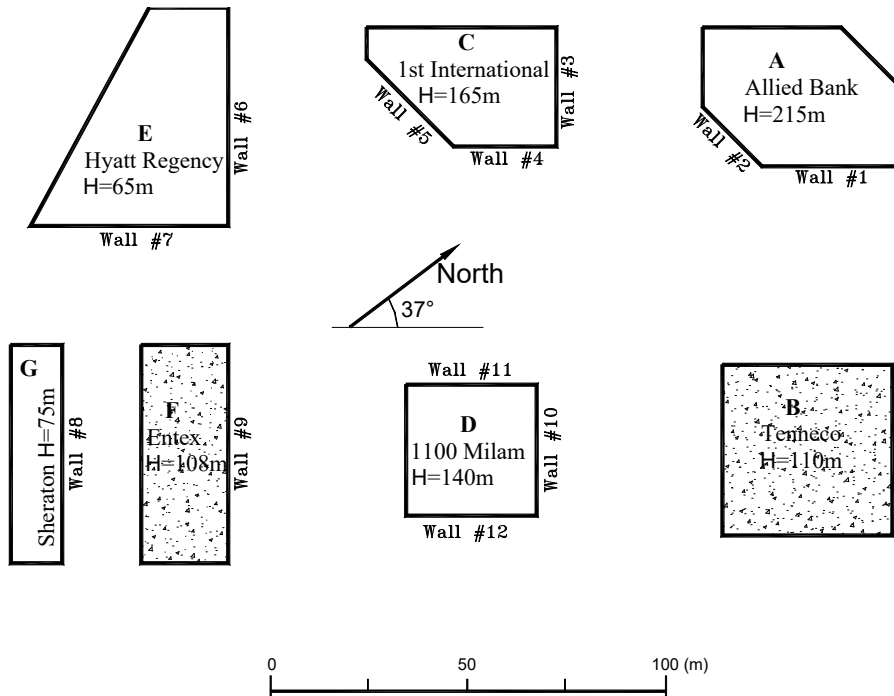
Plan Geometry of the Modeled Buildings in the Houston Downtown Central Business District
